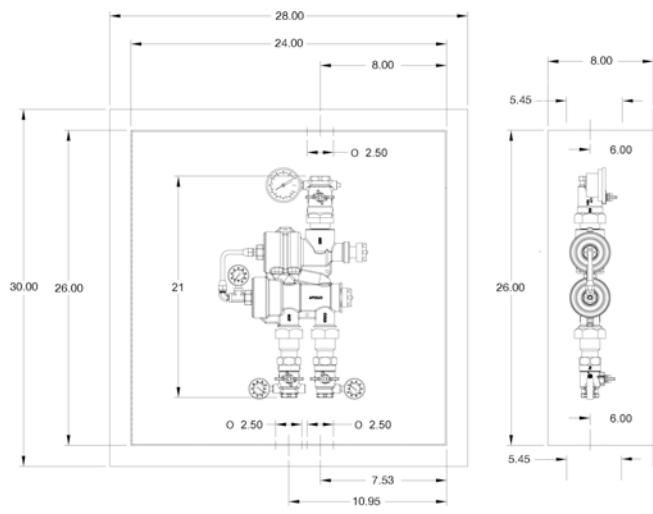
Typical Valve Dimensions with Stainless Steel Recessed Cabinet Option
